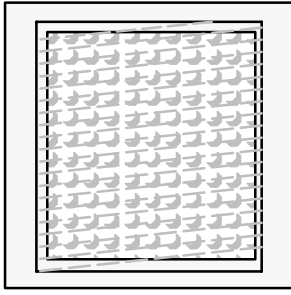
With strips of 8914, overlap glass by about 1/4 inch (7 mm). Also overlap corners.
